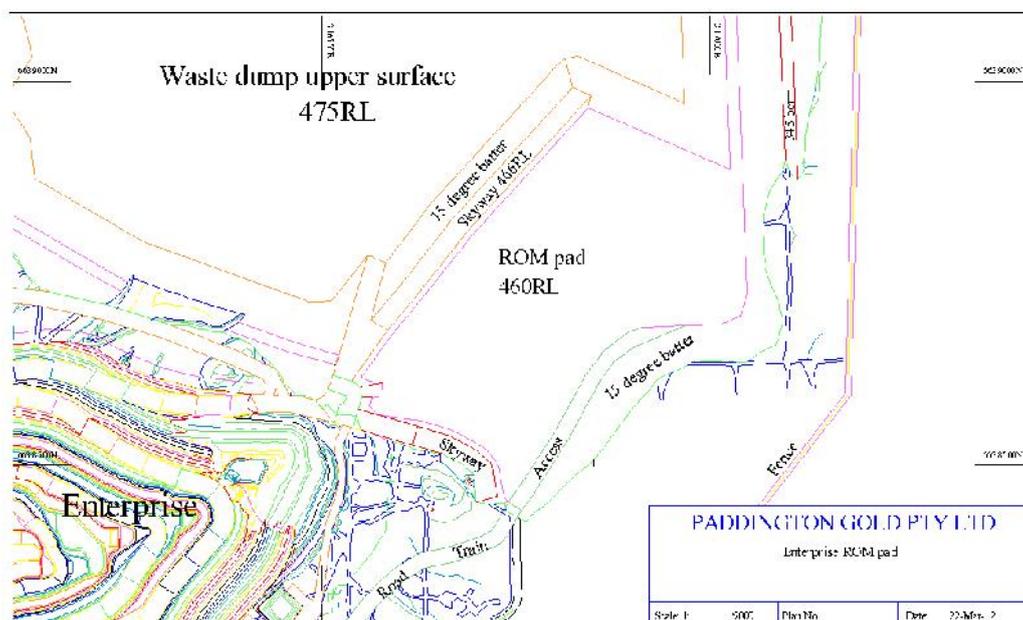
Enterprise Open Cut Mine ROM pad layout
